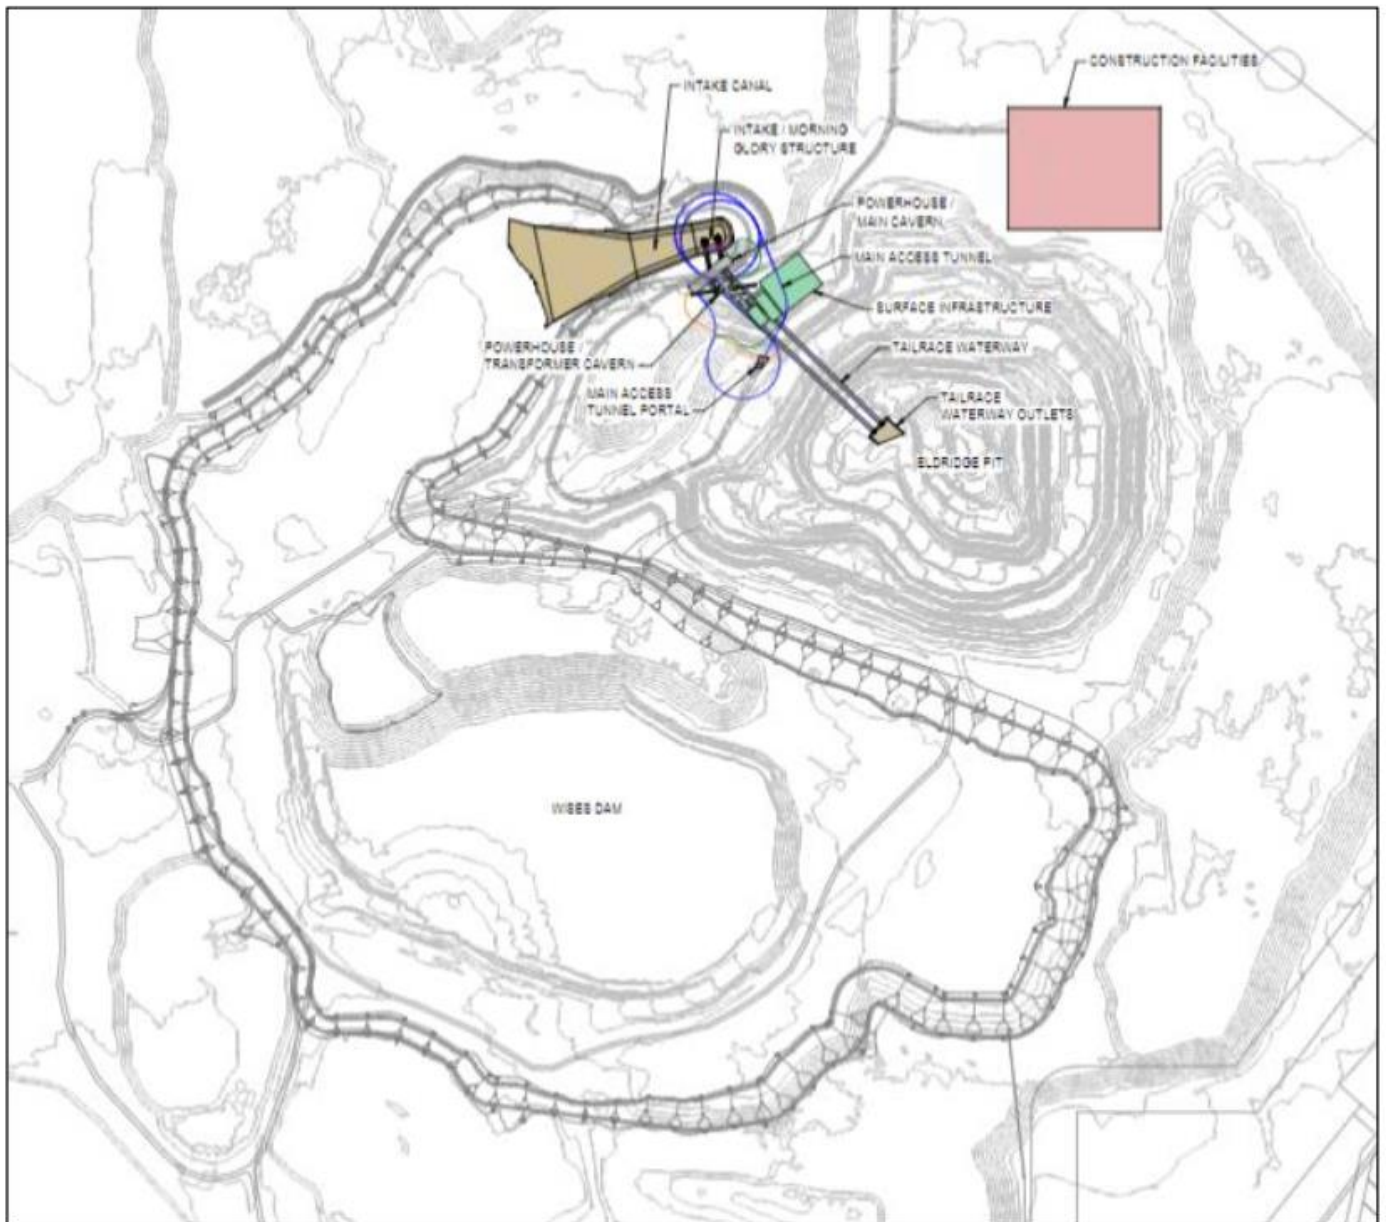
General Arrangement of Wises Dam and Eldridge Pit
